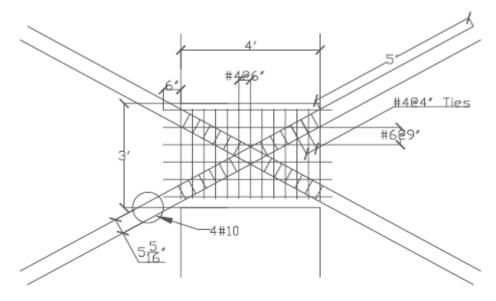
Coupled Beams Diagonal, Vertical and Transverse Reinforcement
